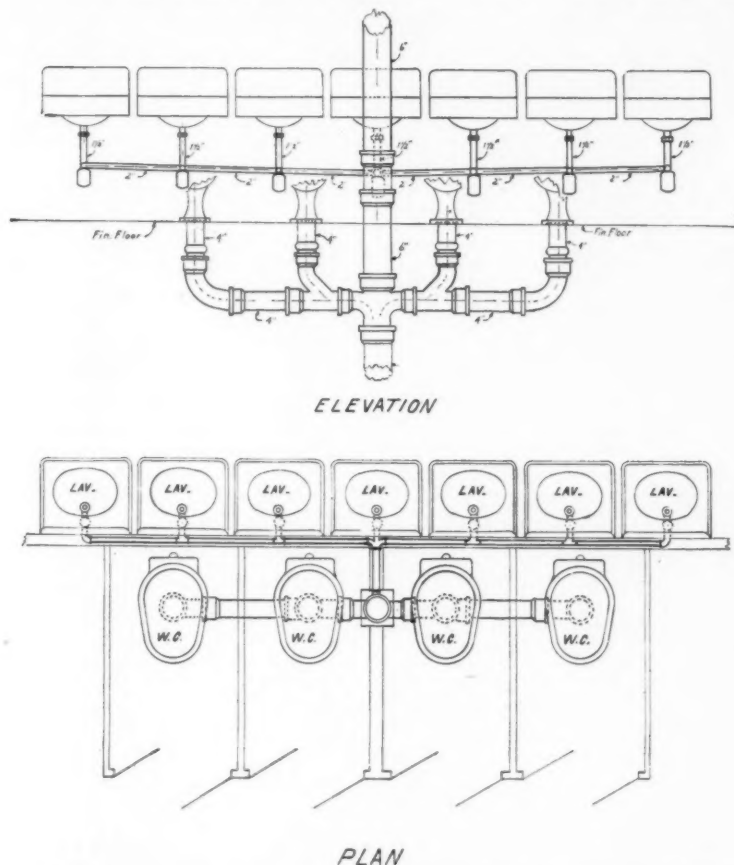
Detail of Possible Arrangement of Unvented Fixtures Permitted on One Floor of a 20-Story Building Under the Revised Plumbing Regulations, New York City.
